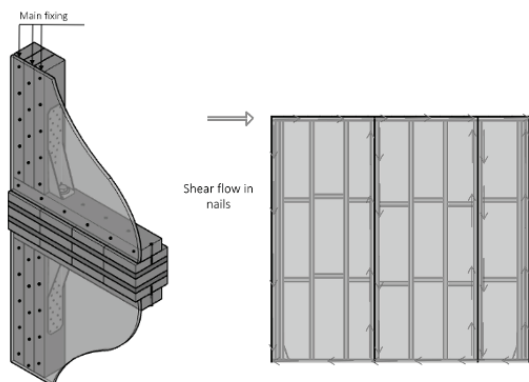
Left: Nailing of plywood to framing elements. Right: Shear flow demands in wall panel.
